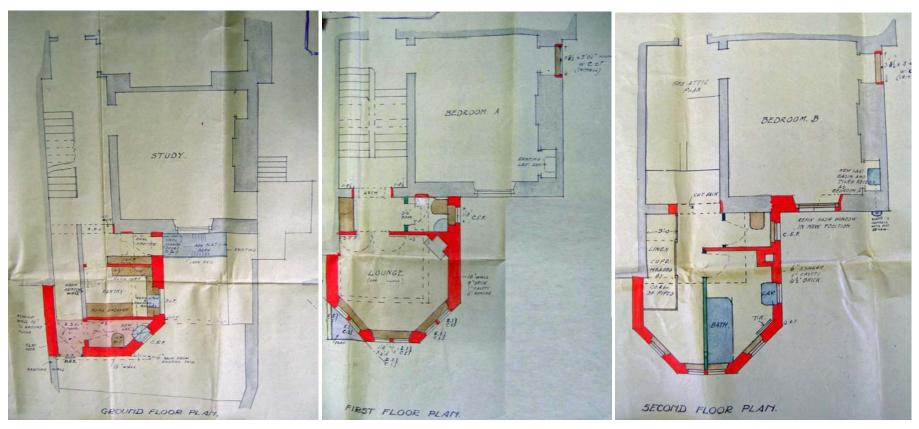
1933 Proposed additions to Ground, First and Second Floors of no. 5 Somerset Place by architects Rolfe & Peto (BRO: BC/5000)
